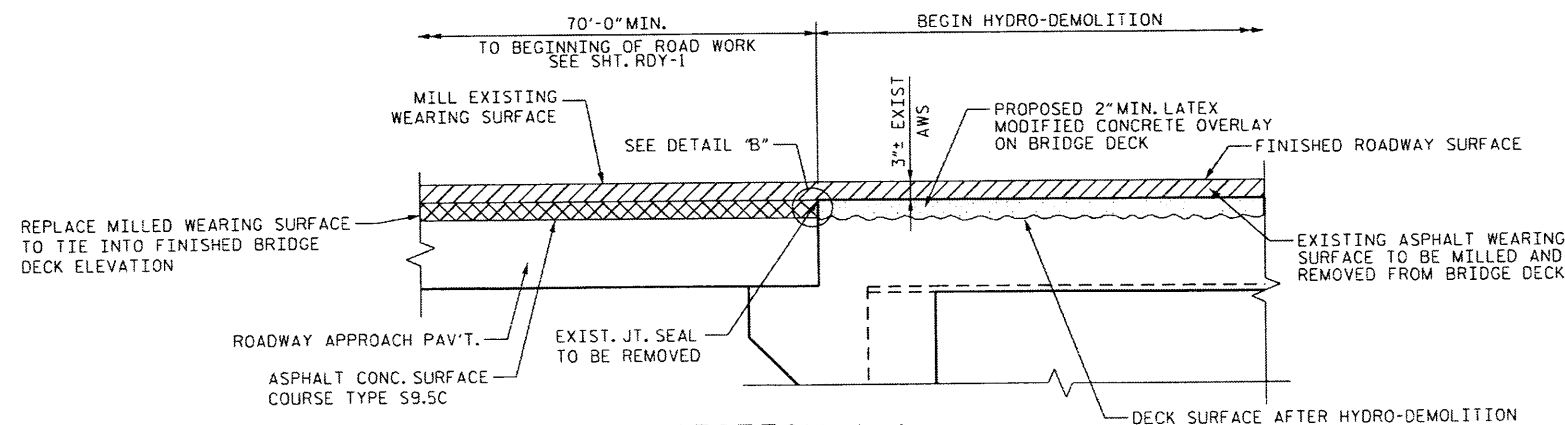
DETAIL FOR LATEX MODIFIED CONCRETE OVERLAY
